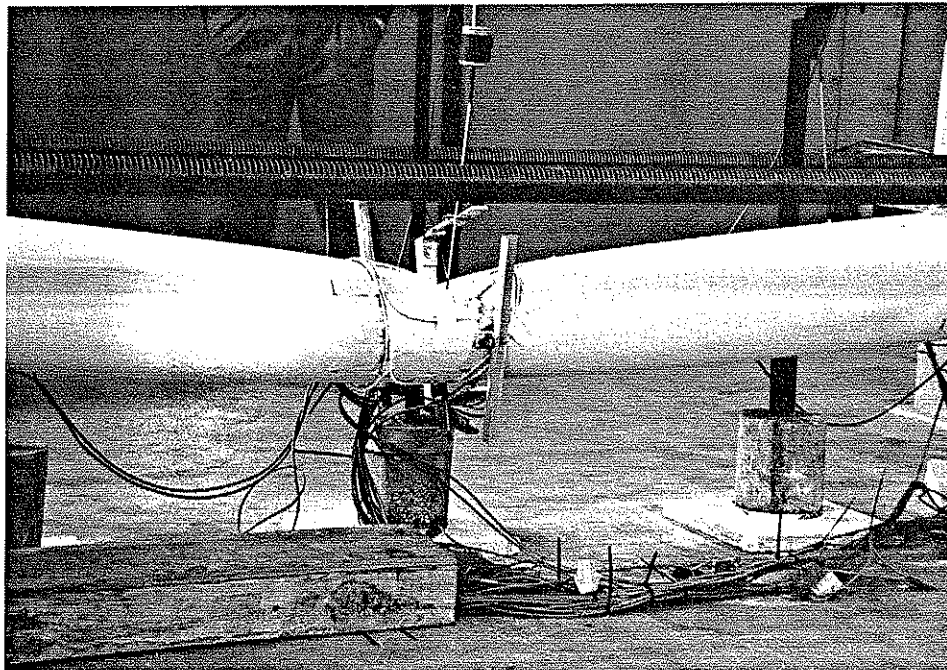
View of the Dented Section of Specimen C2 Following Failure.
